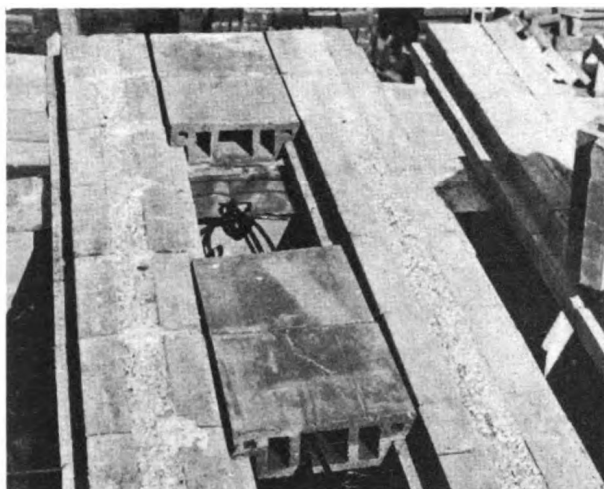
Detail of a joistile floor for one of the all-ceramic houses.
